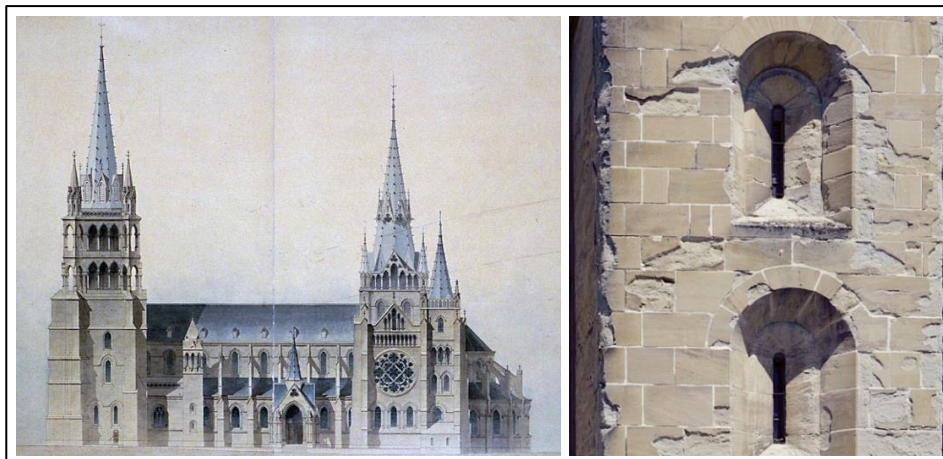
Left. Sketch of the south façade of the Lausanne Cathedral (source: http://www.patrimoine.vd.ch/no_cache/monuments-et-sites/eglises/cathedrale-de-lausanne/); Right. Scaling damage observed on the south façade.
